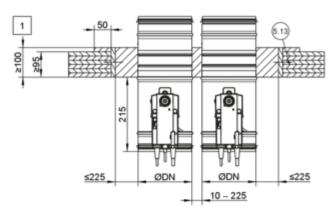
Mortar-based installation into a solid wood wall or CLT wall
